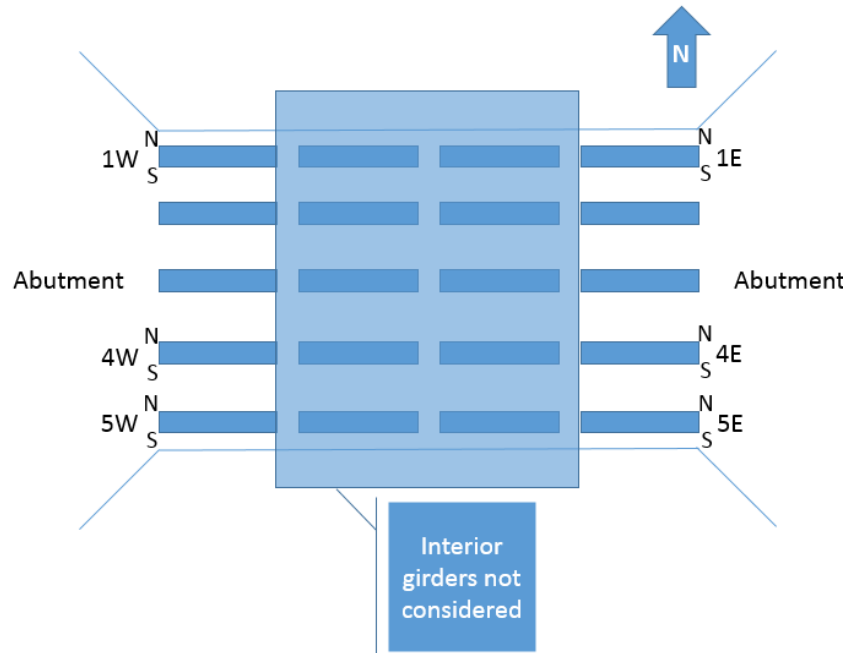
Plan view of an example east-west bridge using the picture reference system
